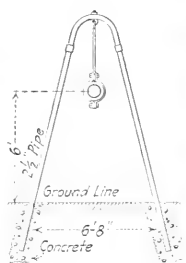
FLEXIBLE SUPPORT FOR PIPE AT EXPANSION JOINTS
